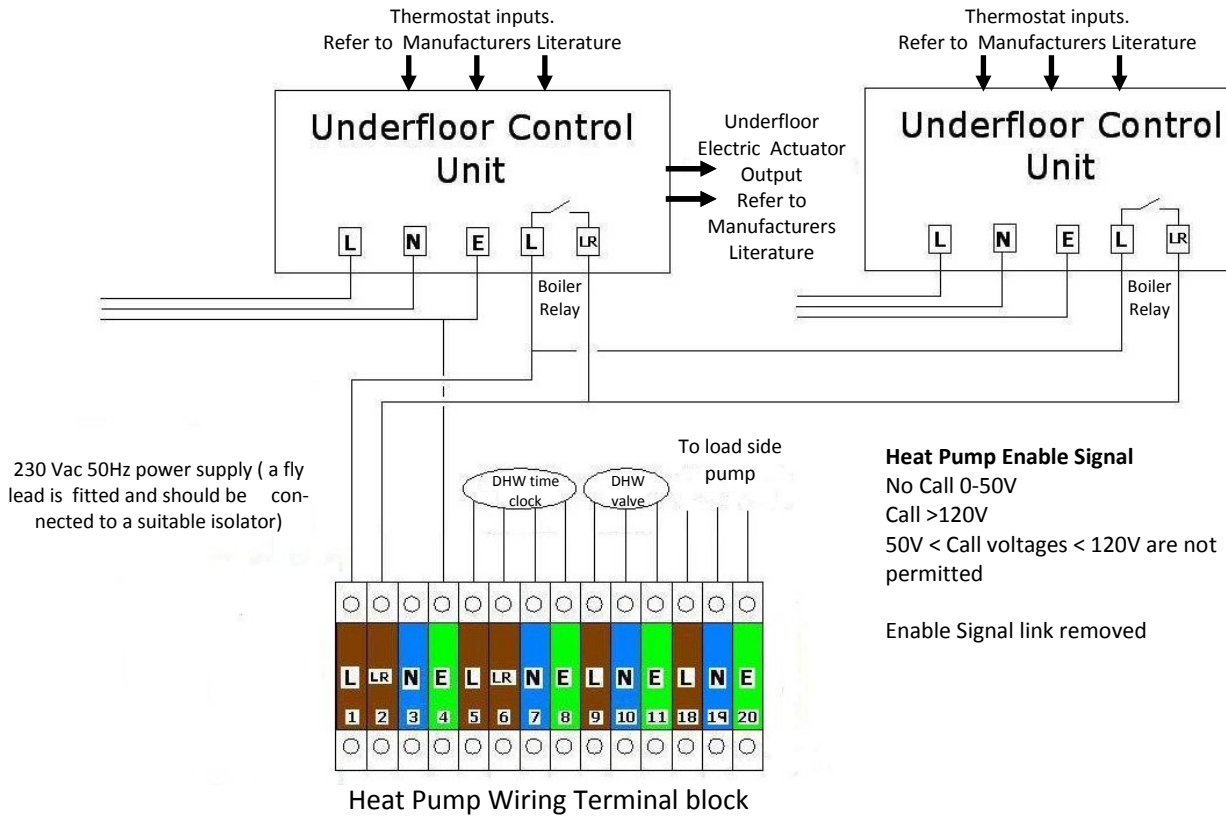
Heat Pump Wiring—Multiple Underfloor Control Units
